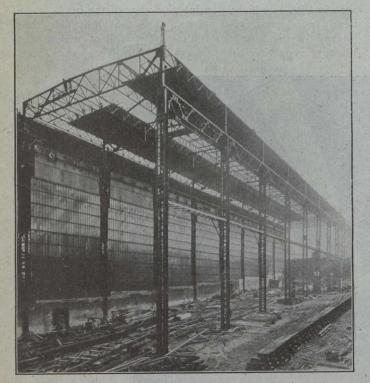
Erection of First Section of Berth. All the Glass and Sash in the Side of Adjoining Building was Later Removed
